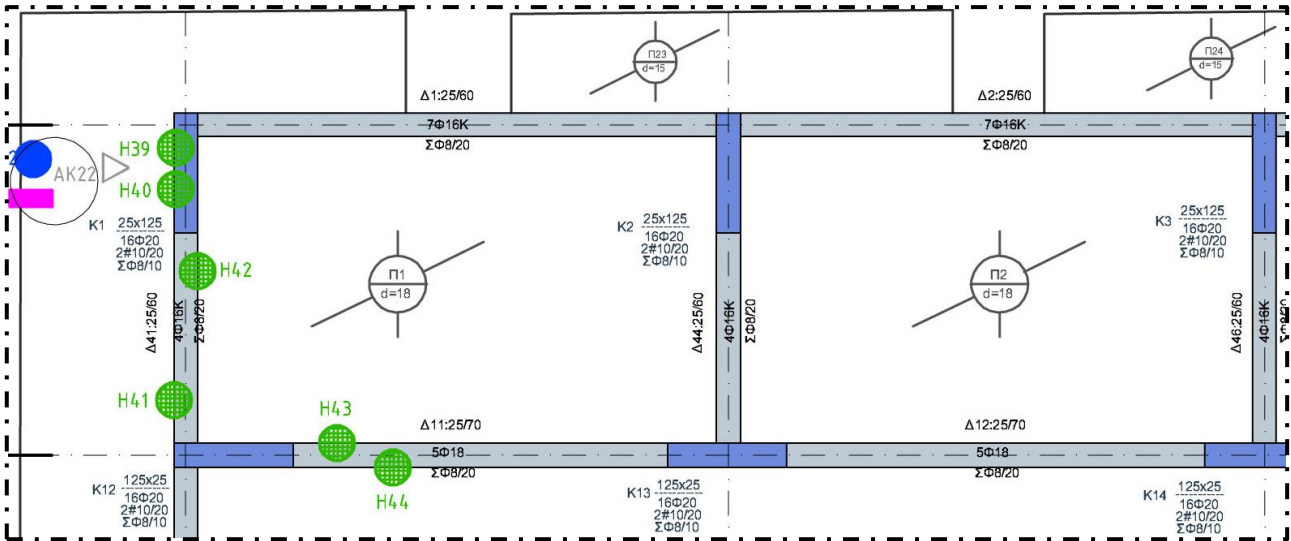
Extract of the structural survey of the ceiling of the first floor – Source: [143]
